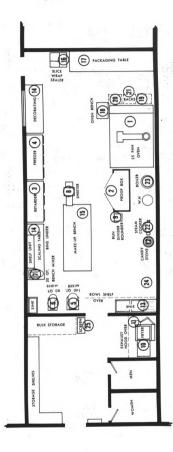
EQUIPMENT LAYOUT FOR ON-PREMISE BAKERI #2
